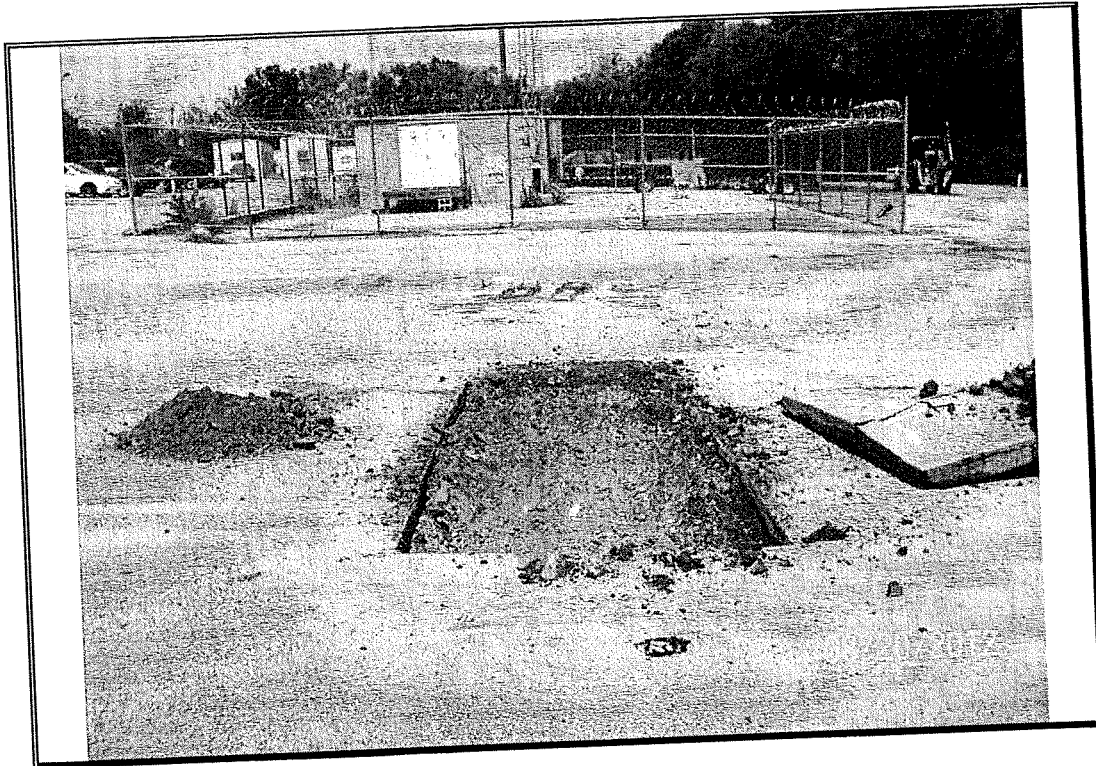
View of "slag like" material just below the asphalt surface at TP-6.
